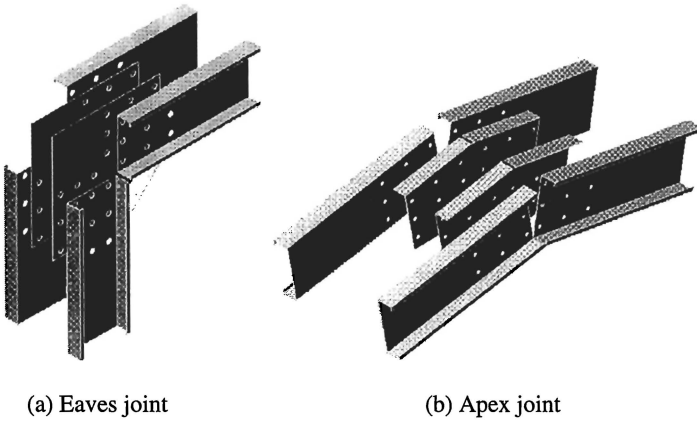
Details of joints of proposed cold-formed steel portal framing system
